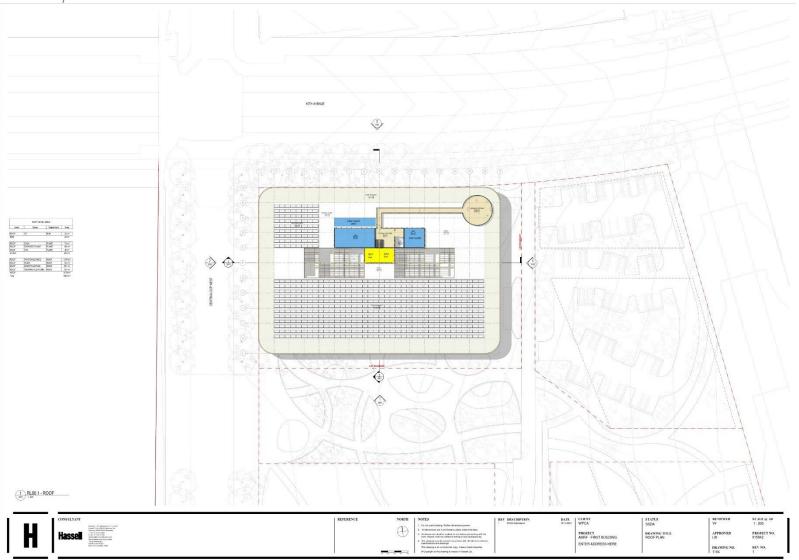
AMRF – First Building roof plan (Architectural drawings prepared by Hassell, 2021).
